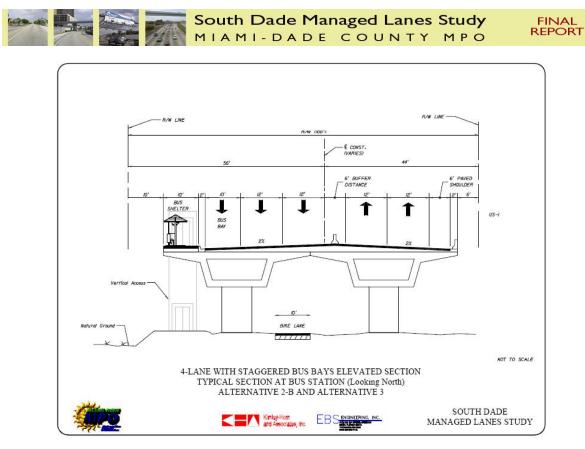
Typical Cross Section of the Four-Lane Elevated Alternative at a Station
